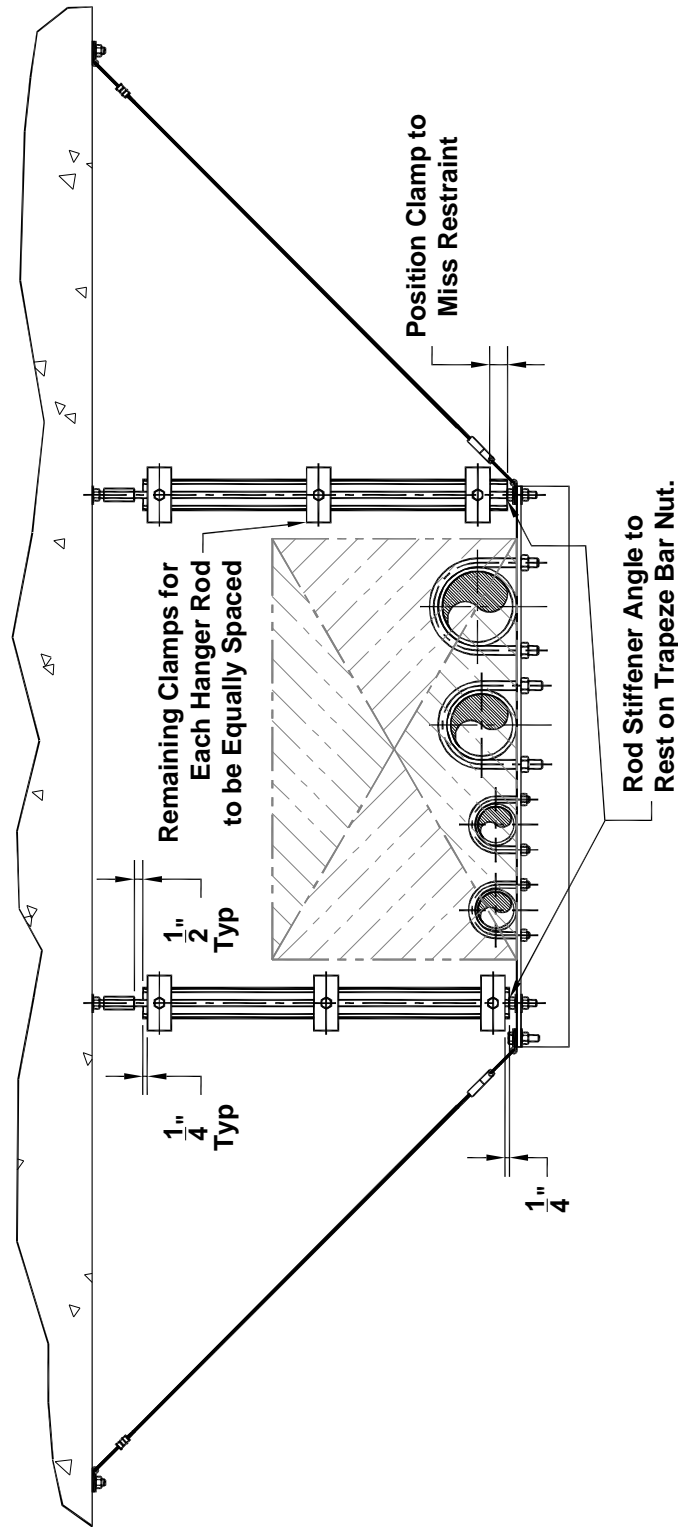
; Typical Rod Stiffener Installation for Trapeze Supported Pipe & Duct – Two Rods
